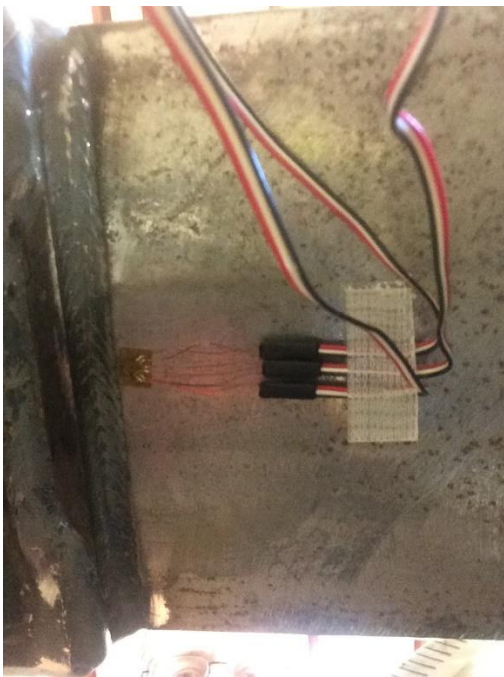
Sample strain gauge placement at weld toe
